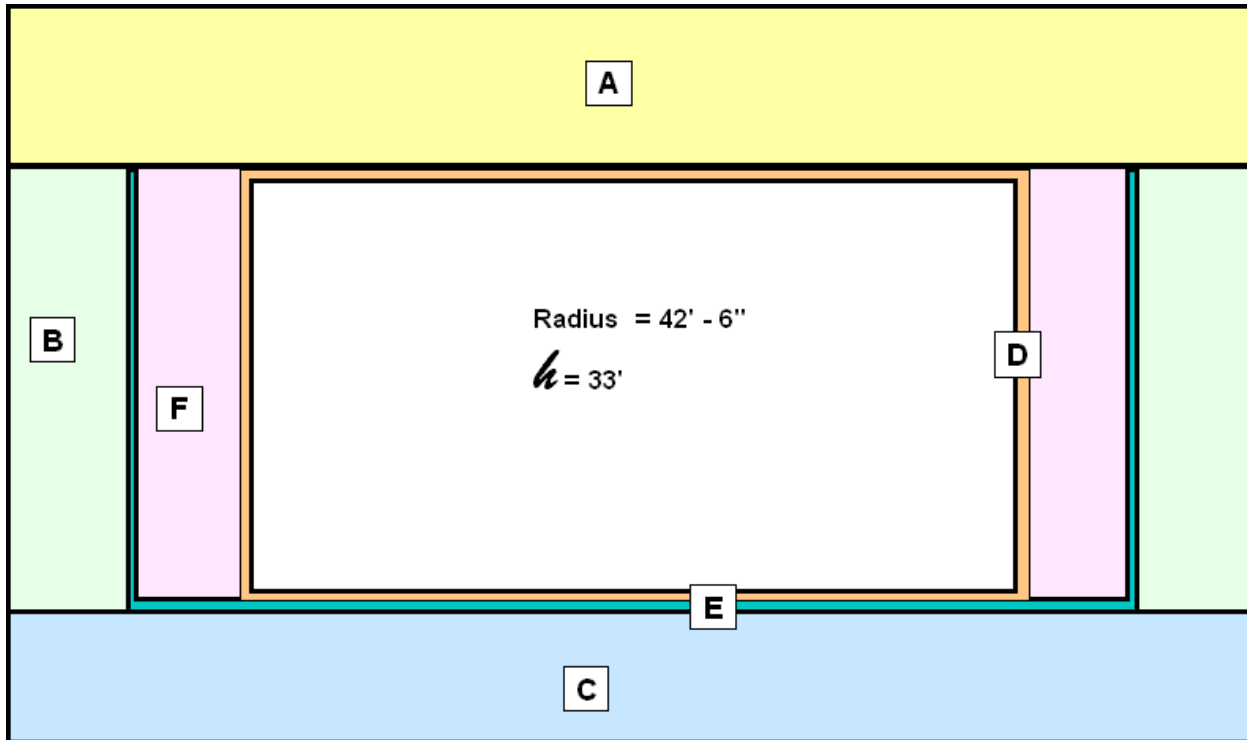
Typical Type III Tank Modeling Dimensions
